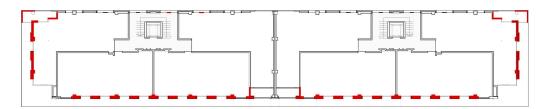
Cerdanyola residential building, typical floor plan (adaptation of the project, Frutos, 2006a).
